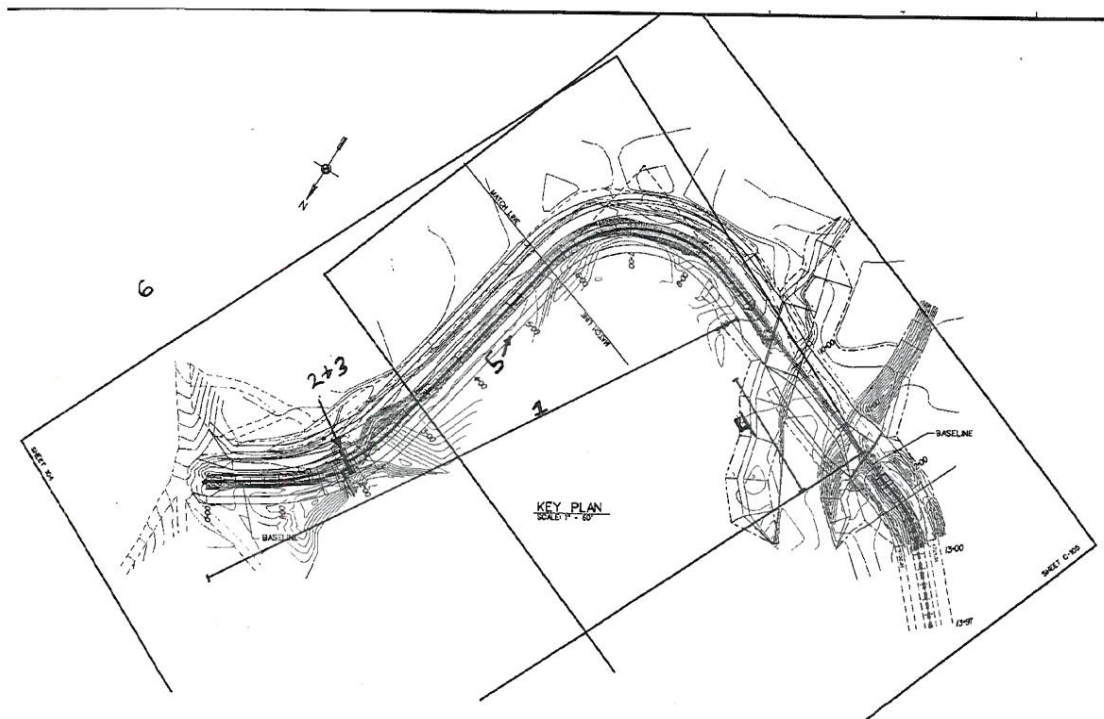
Key Plan of the Proposed Project Adapted from: La Joya Acequia System improvements Phase III Key Plan and General Notes sheet no. C-102
